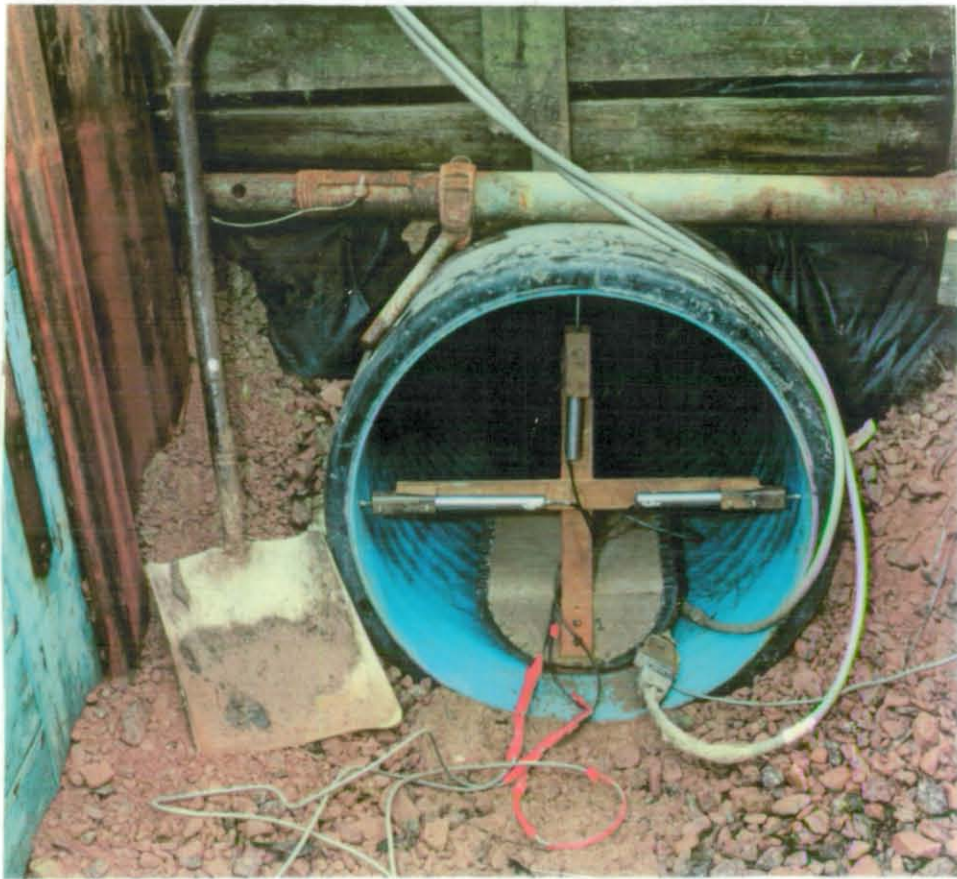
Measurement Equipment in the Pipe (Prior to Centring).
